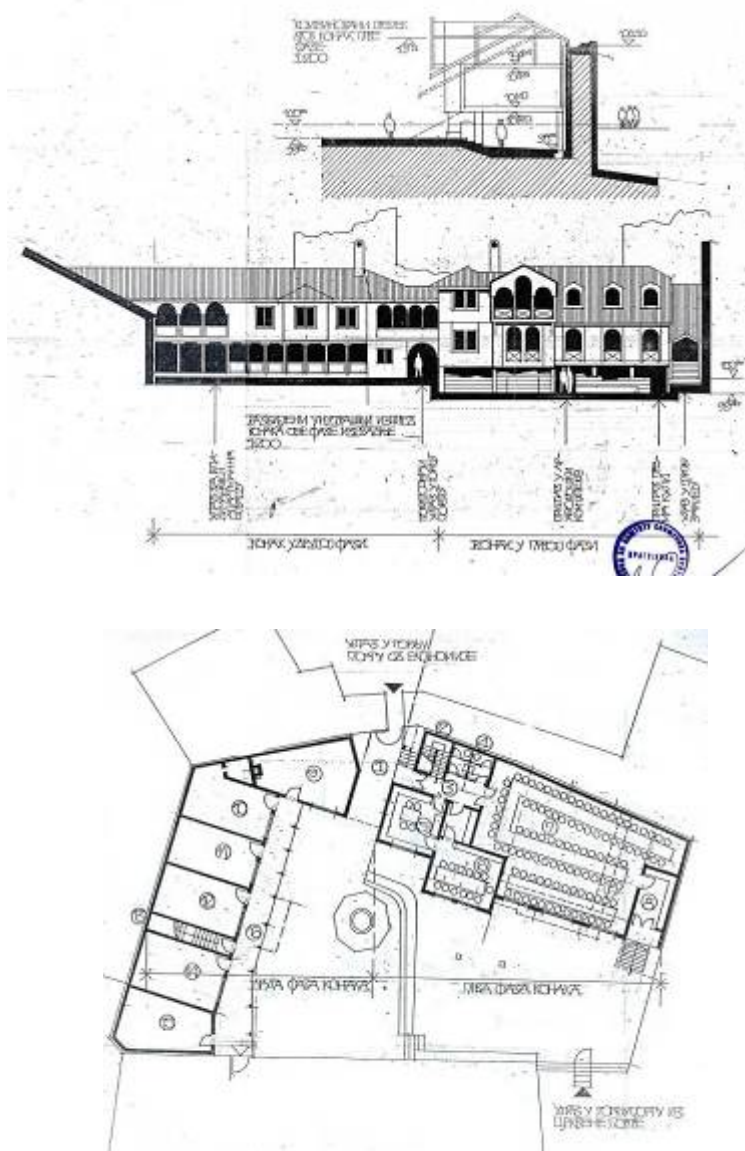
First and second phase of the New Hose in the Small Yard – project for the new adding (1993) – cross section, west and south elevation (together) and the first floor
